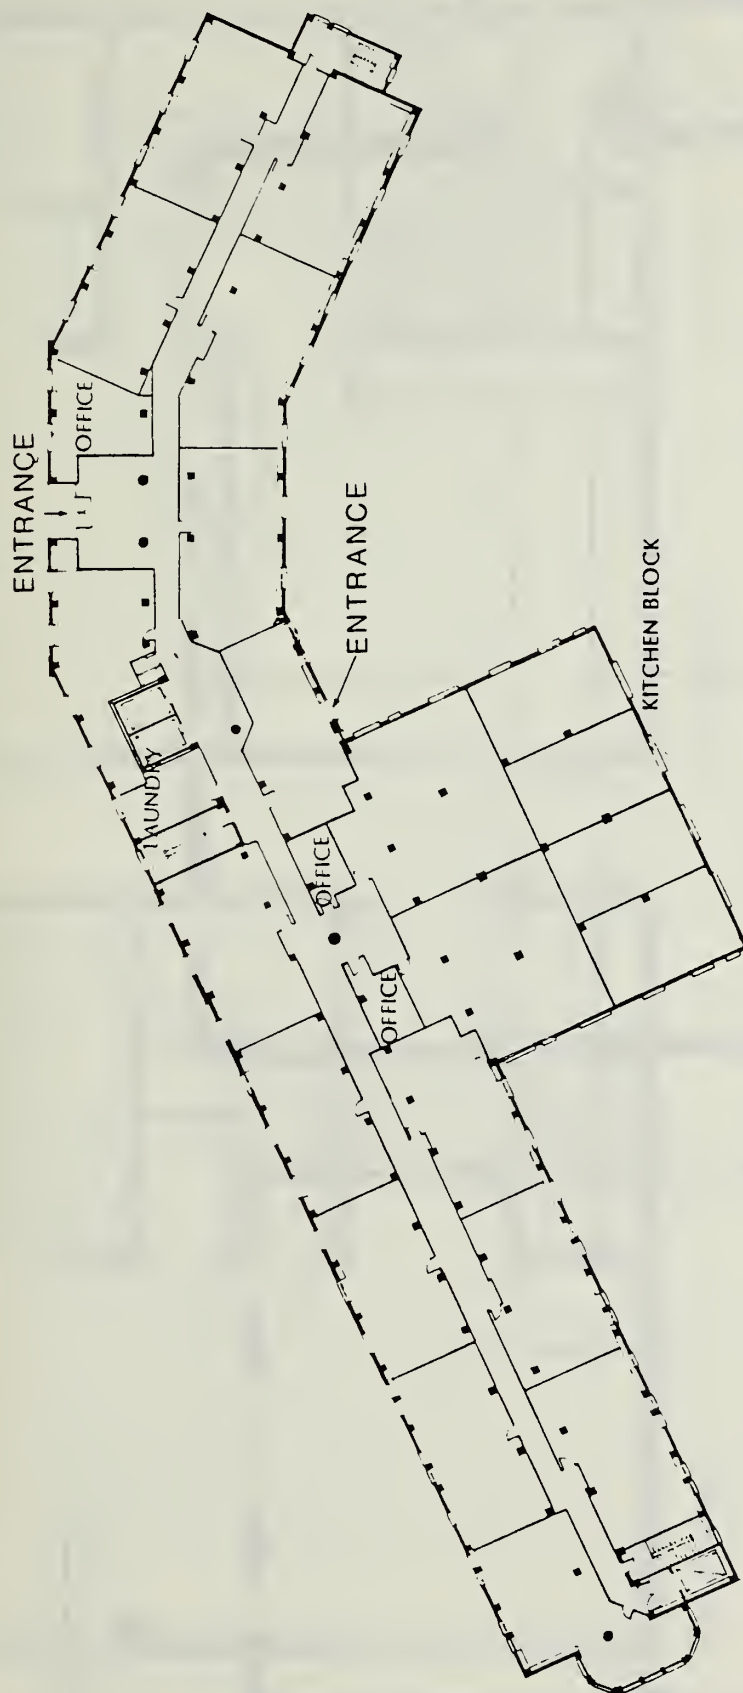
Hospital Buildings Floor Plan (Entry Level)
